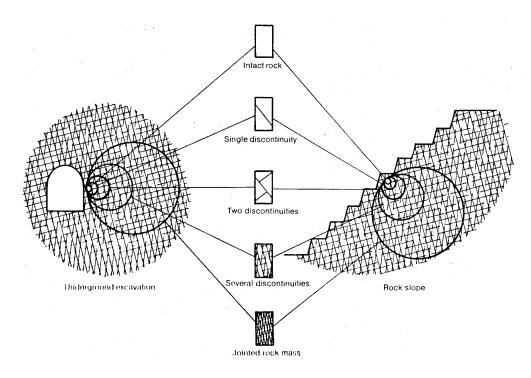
Effect of scale on the type of rock mass behavior model which should be used in designing underground excavations and slopes (after Hoek, 1983).
